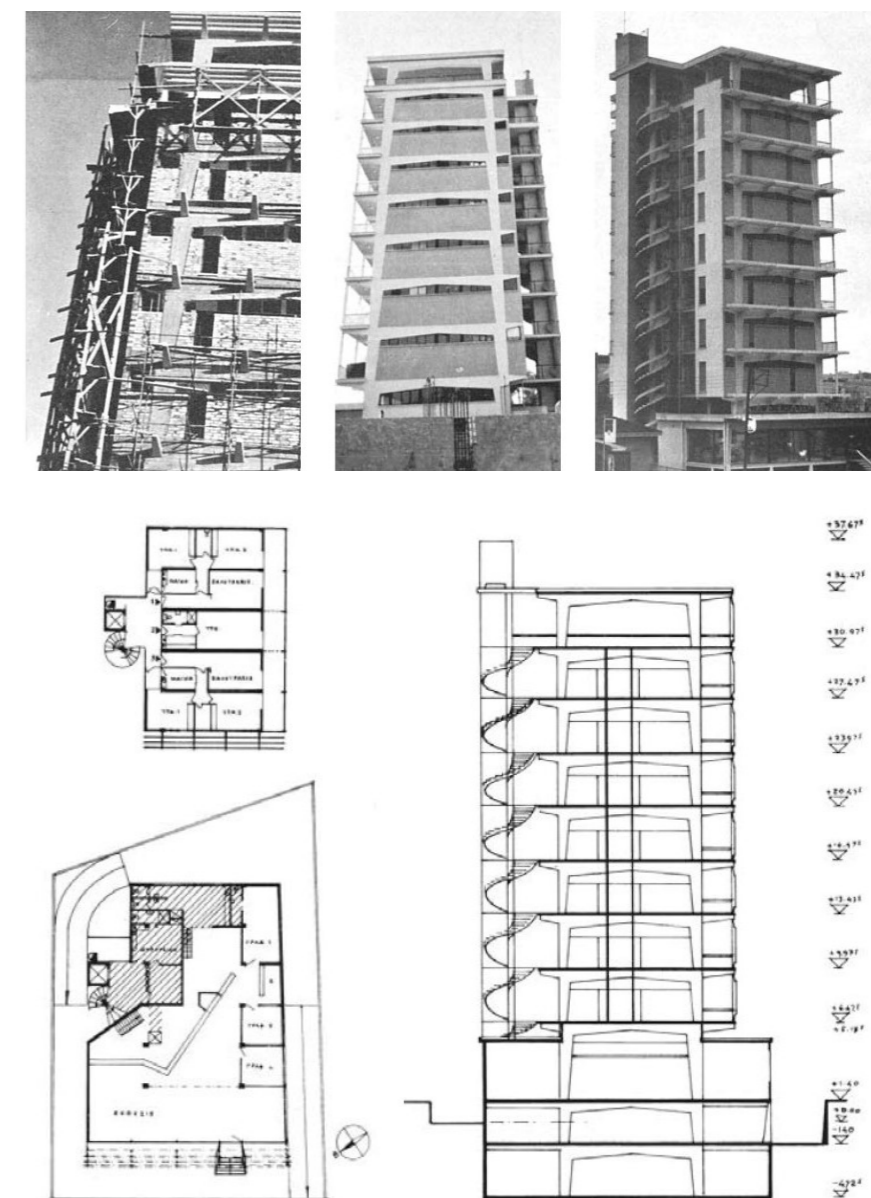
Photographs and plans of Alexandrou Demetriou Tower.
